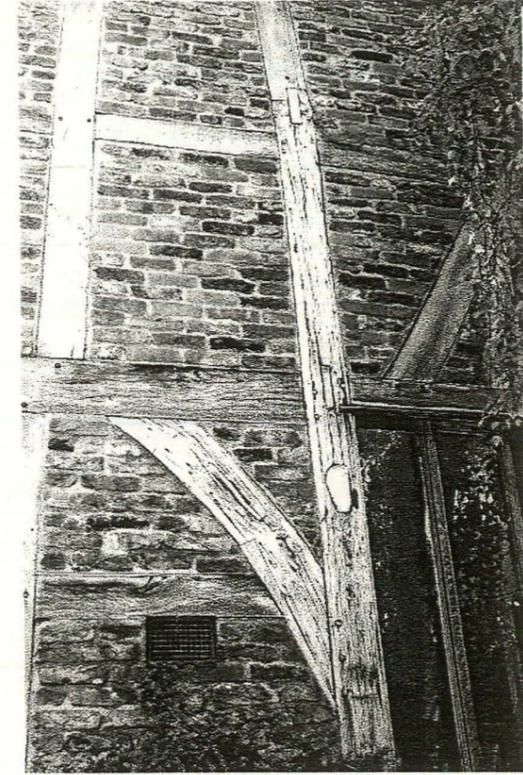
Pescod Hall, blocked mortice joints on west wall
